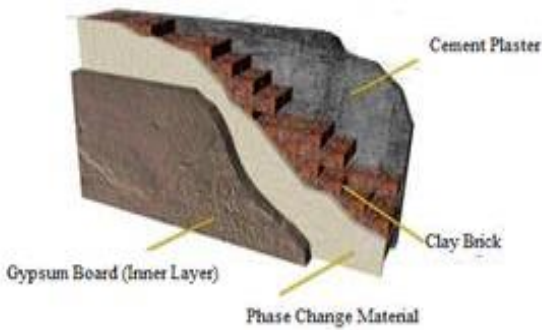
Non-Conventional Wall Construction with Gypsum Board
